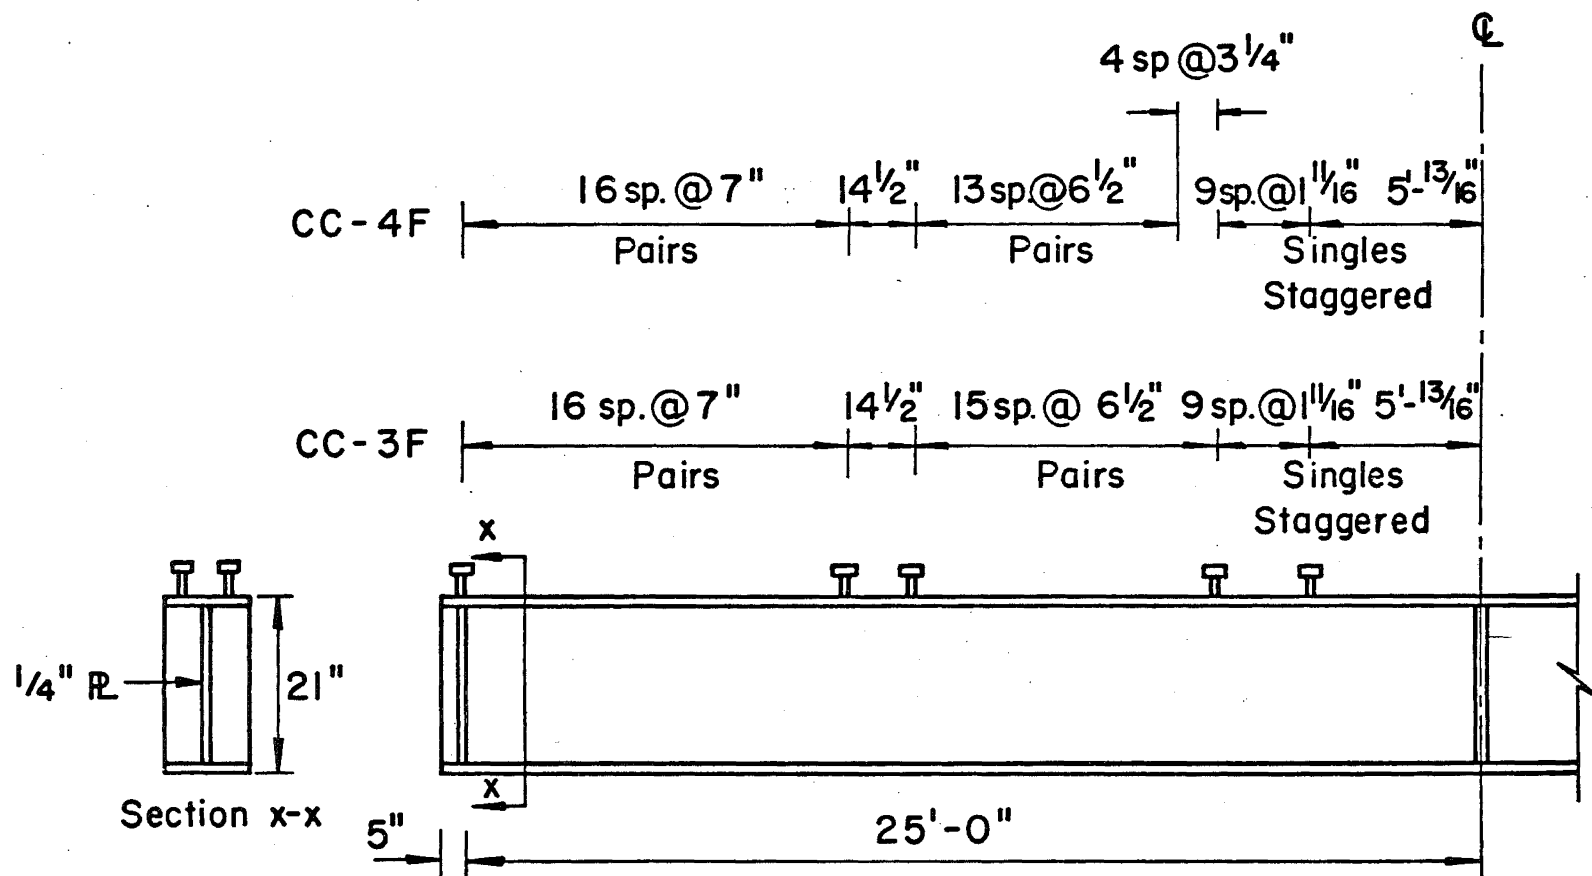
Details of the Steel Beams For CC-3F and CC-4F
